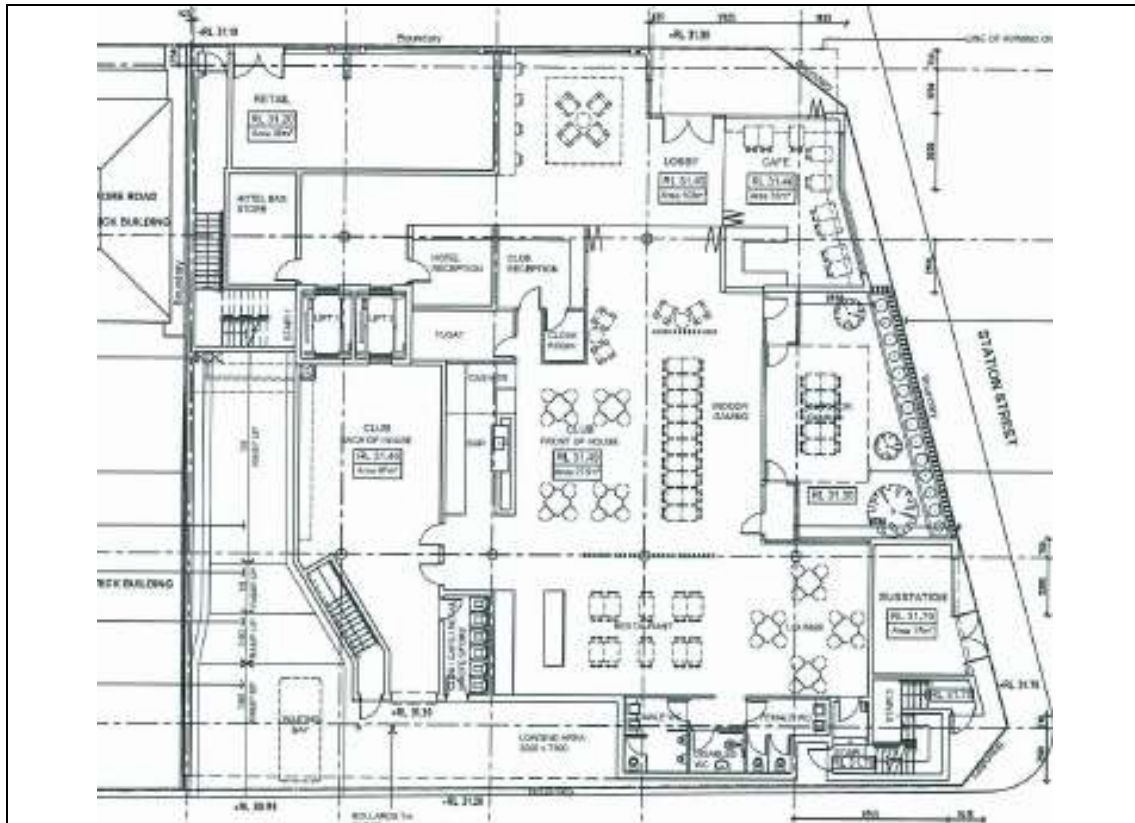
Ground Floor Plan (Hotel Foyer, RSL Club, Café and Shop)
